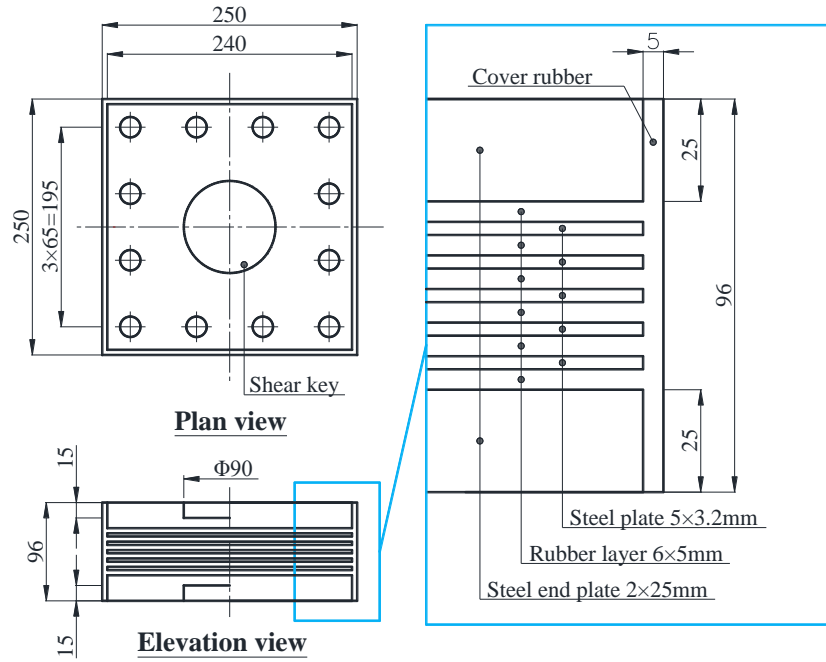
Dimensions of HDR bearing specimen (mm).
